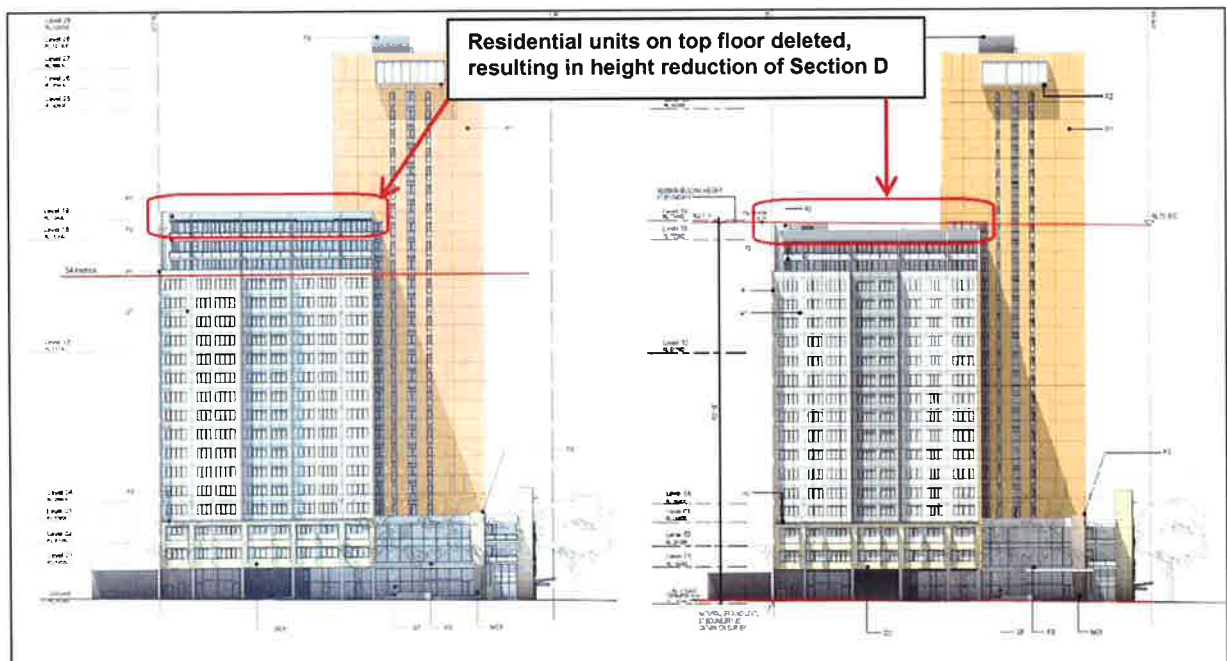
Hunter Street (southern elevation) - Comparison between approved (left) and proposed (right)
